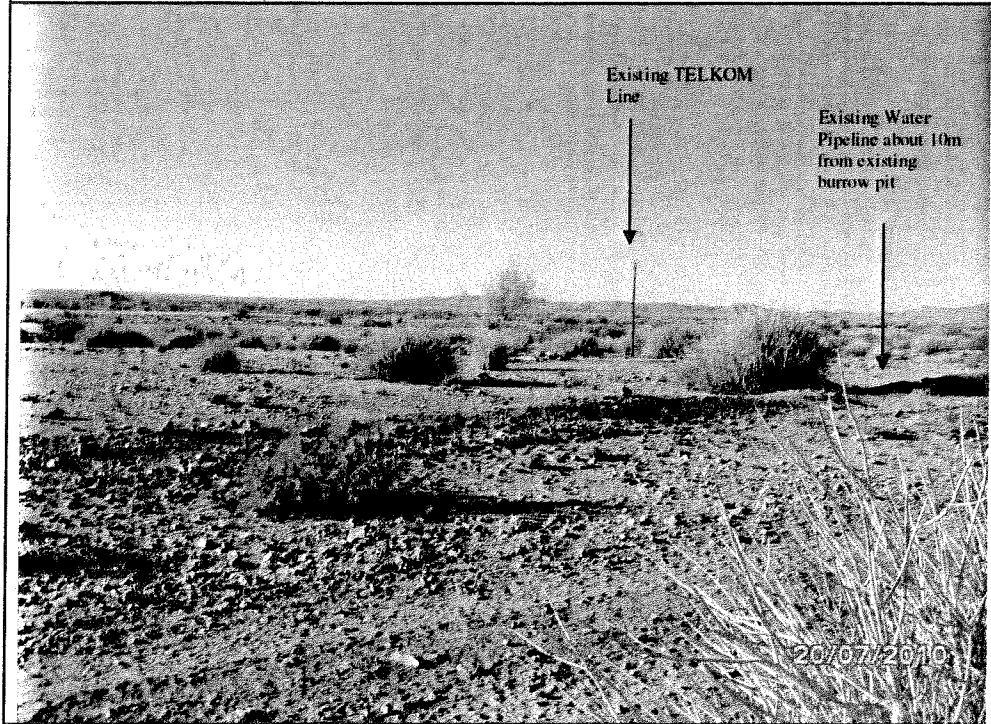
Showing the site for the extension of the existing burrow pit in a western direction.
